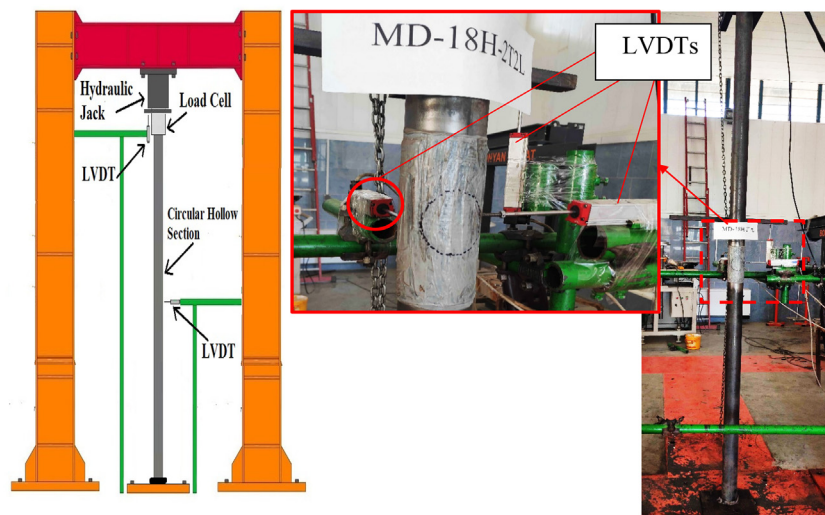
Columns under hydraulic jack and installation of LVDTs.
